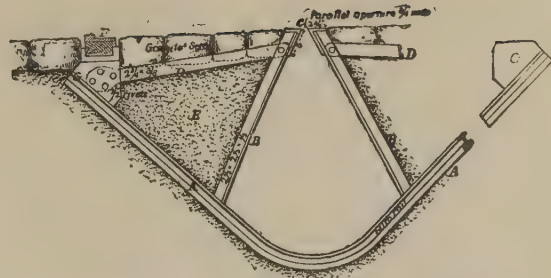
ORIGINAL CONSTRUCTION—MARKET STREET LINE.
